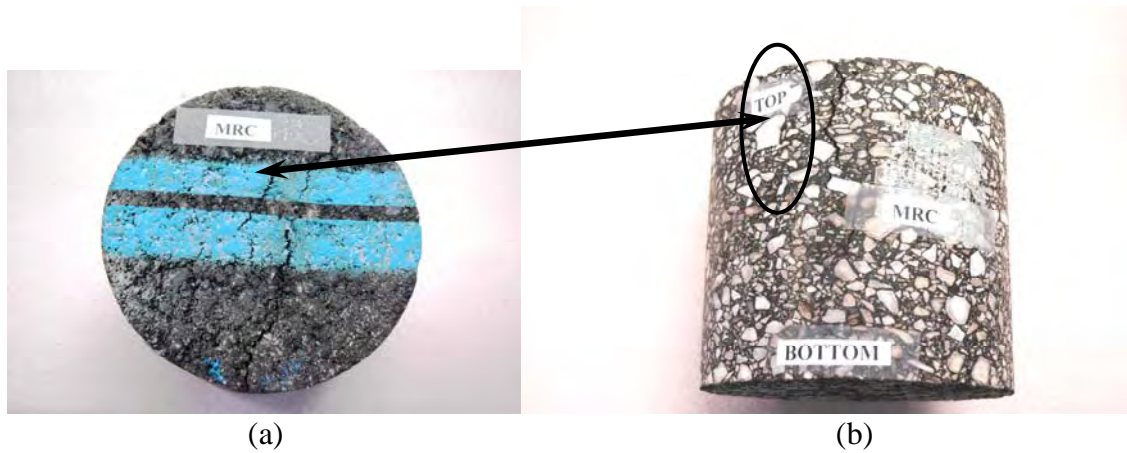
Cores Taken Through Fatigue Cracks—(a) Top View and (b) Side View
